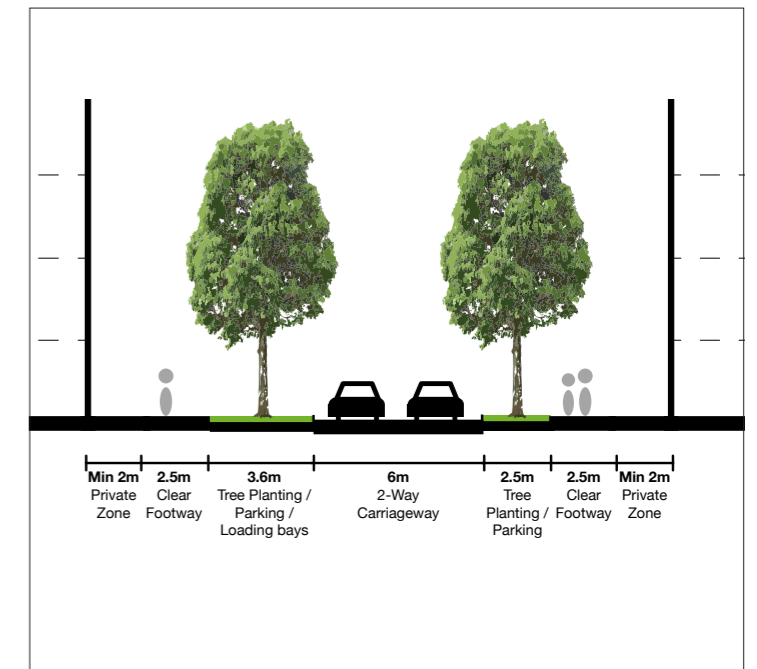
OKR10 LDS - Indicative section through 2-way carriageway street
